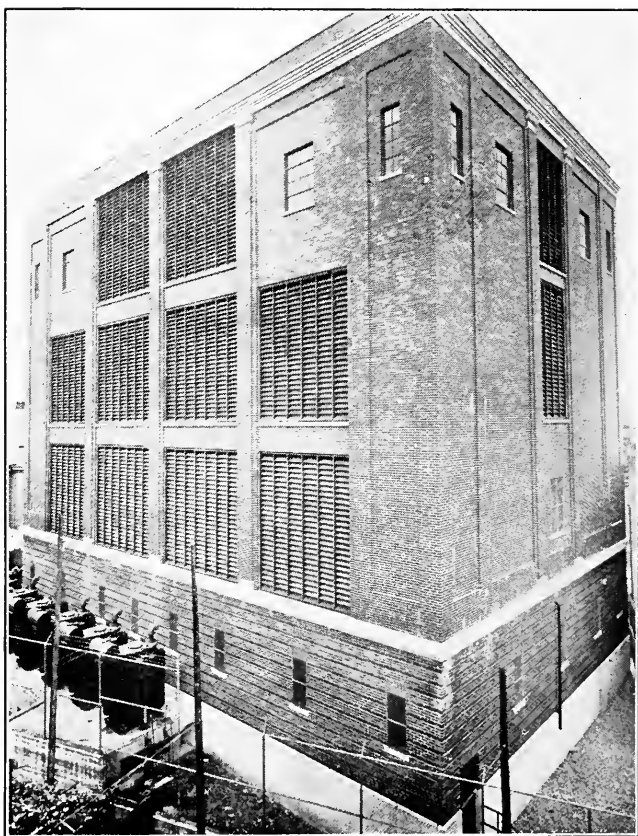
PLATE VI.—EAST BOSTON VENTILATION BUILDING
